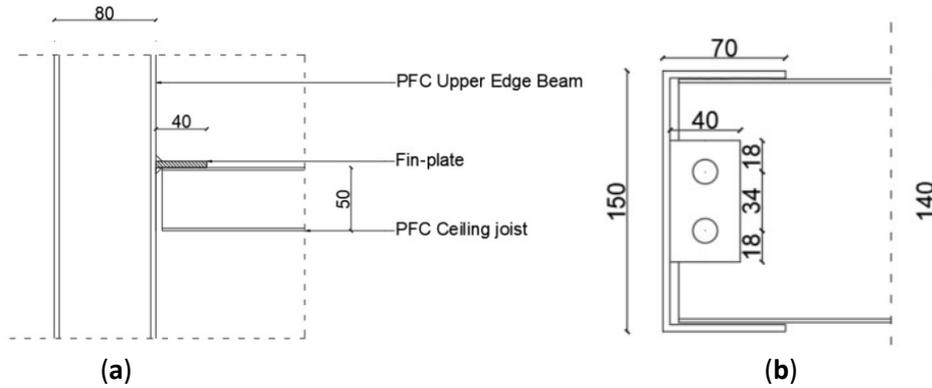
Ceiling joist-Edge beam connection: (a) Top view, (b) Cross-section (own work).
